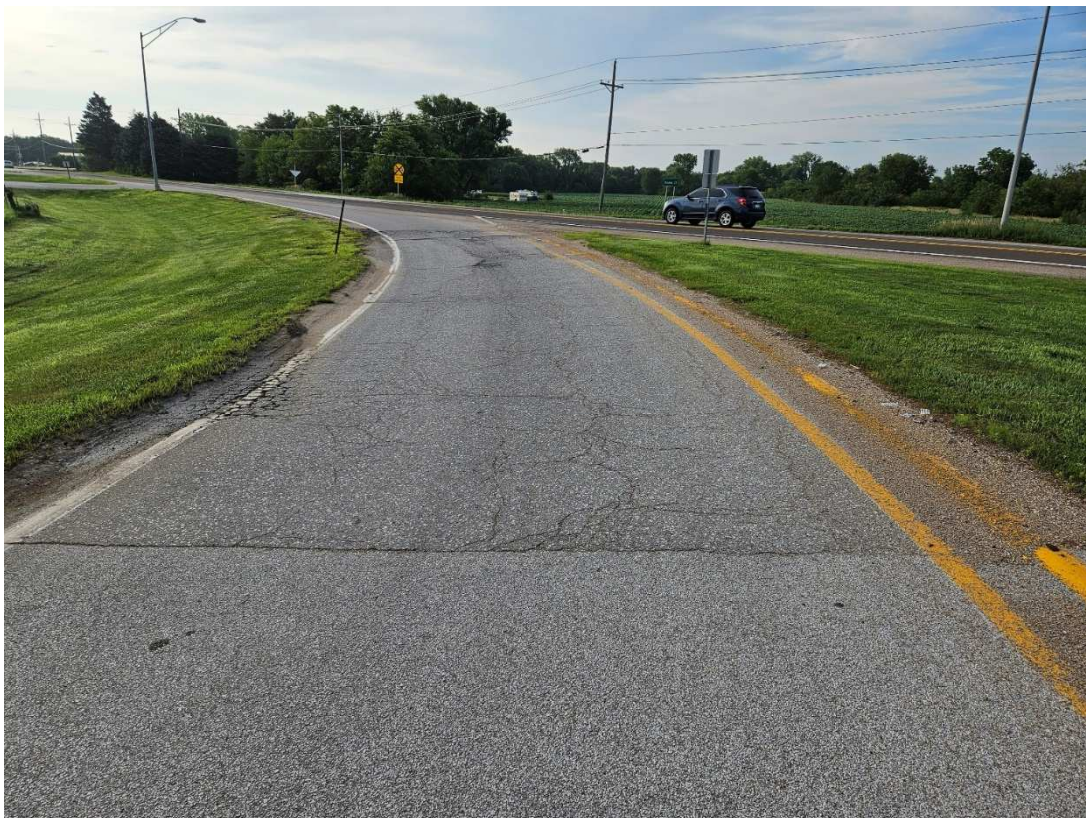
092RA, PAVEMENT DISTRESSES NEAR HIGHWAY 92
